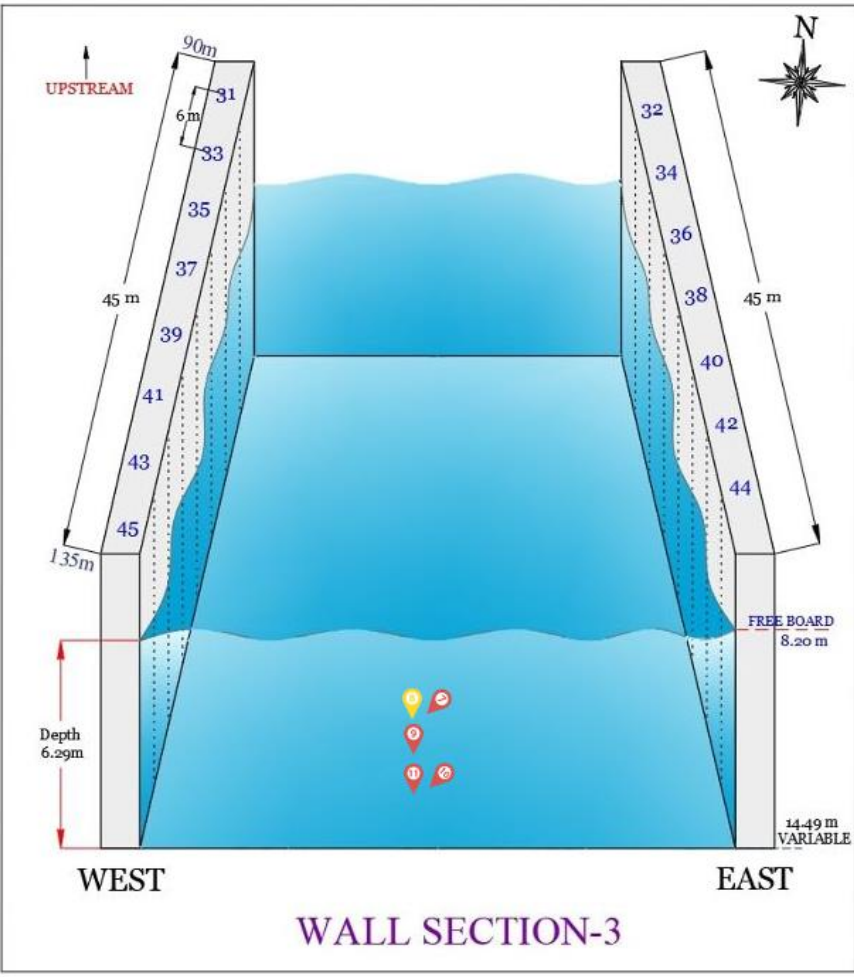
Heat map and Observations at Wall Bottom Section 31 - 45
